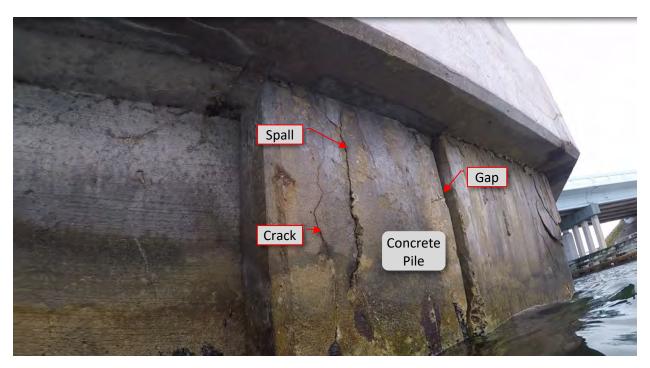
P44. STA 6+07. Cracks/spalls at both flanges at pile. Gap at construction/expansion joint.
